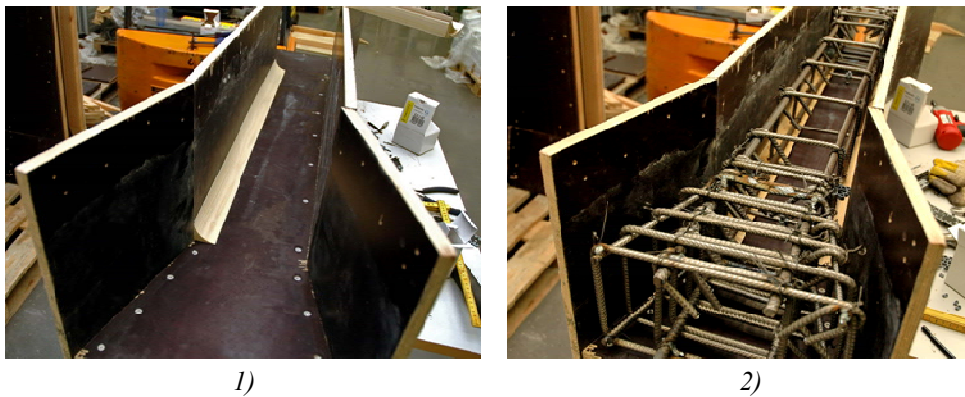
1) Wood form with corner strip. 2) Inserted reinforcement cage.
